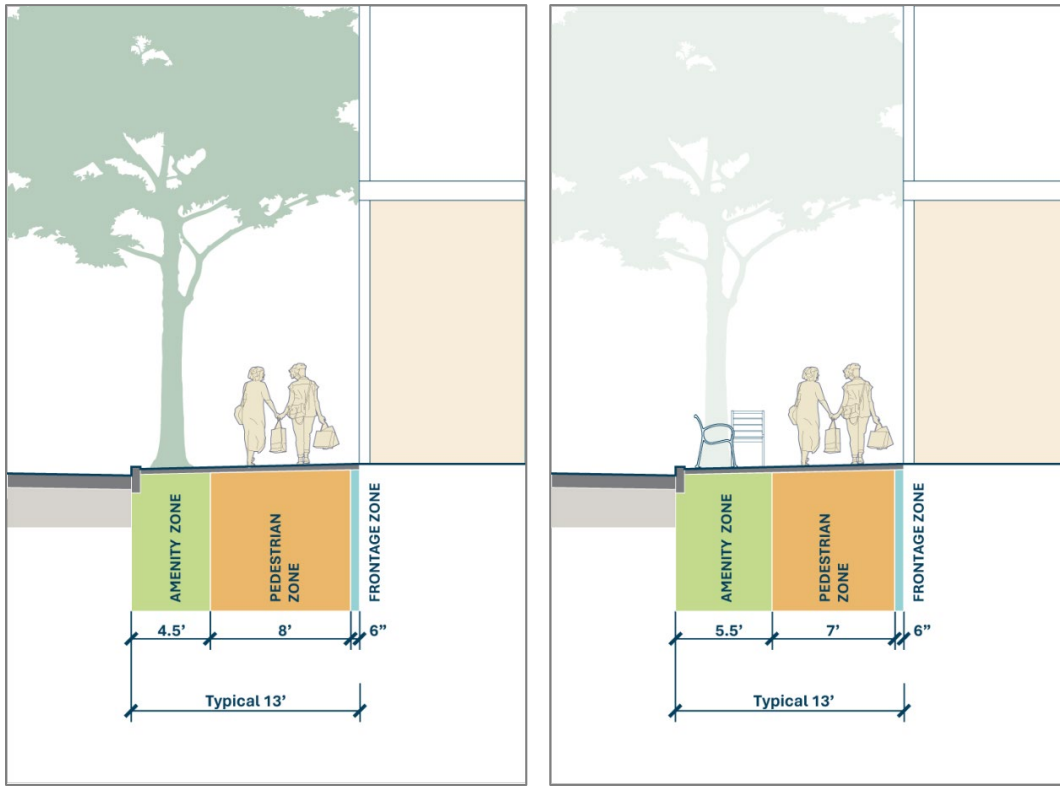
Left: Section A - Sidewalk at tree well. Right: Section B – Sidewalk with public seating
